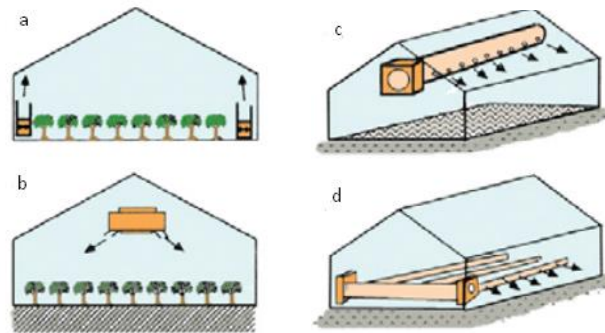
Greenhouse heating system using convectors (a), air-installed fan heaters (b), high-installed air channel (c), and low-mounted air channels (d) [25].
